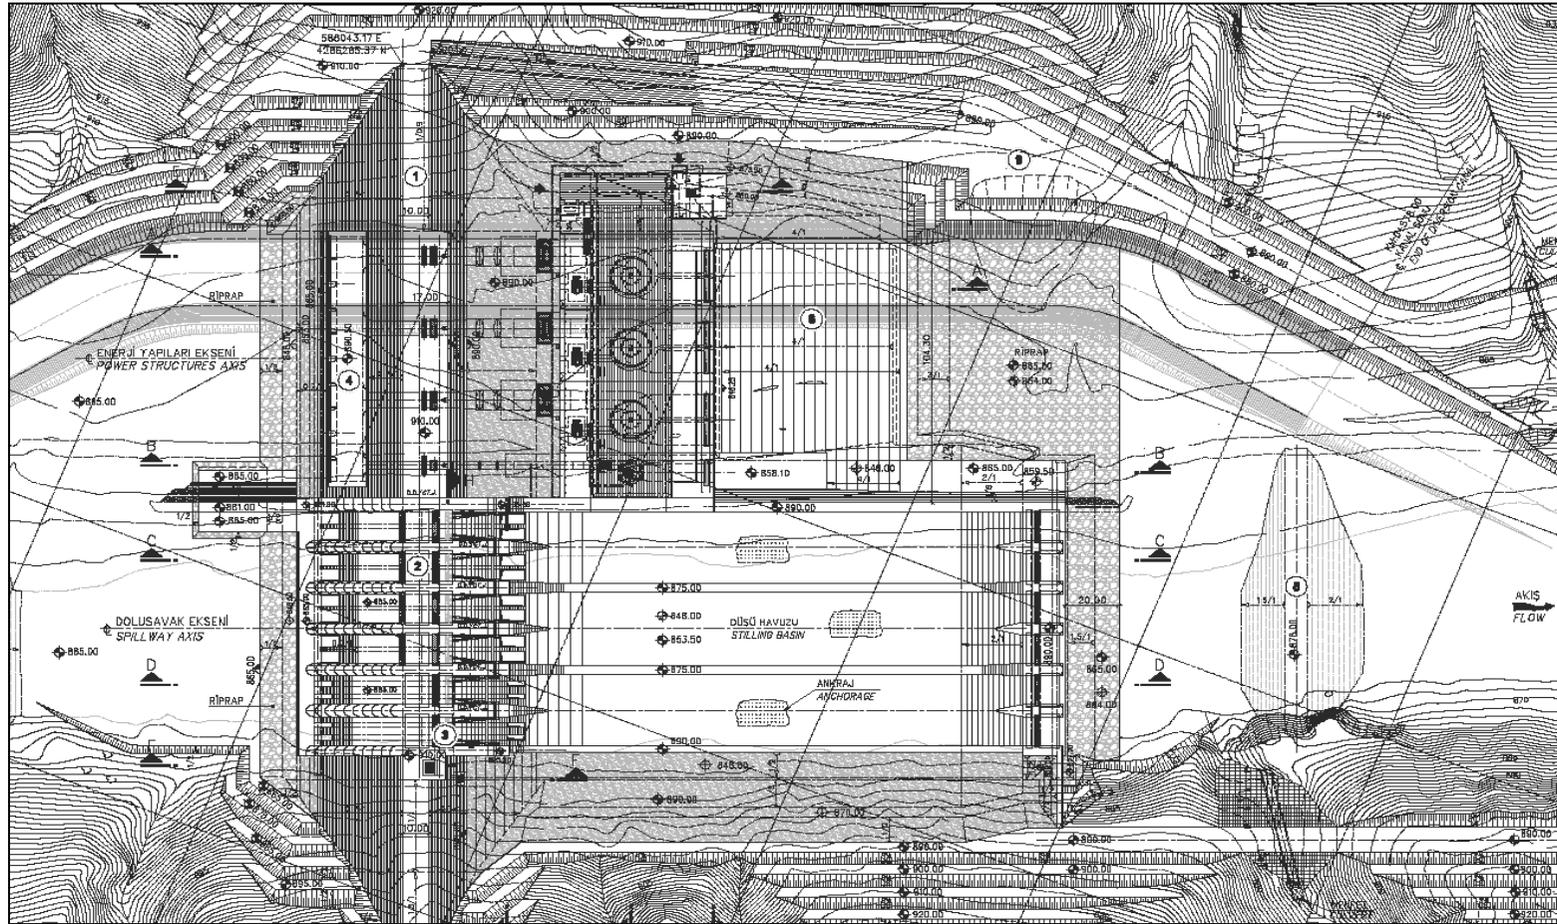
General plan of Beyhan 2 Dam and HEPP (Temelsu International Engineering Services Inc., 2011)
